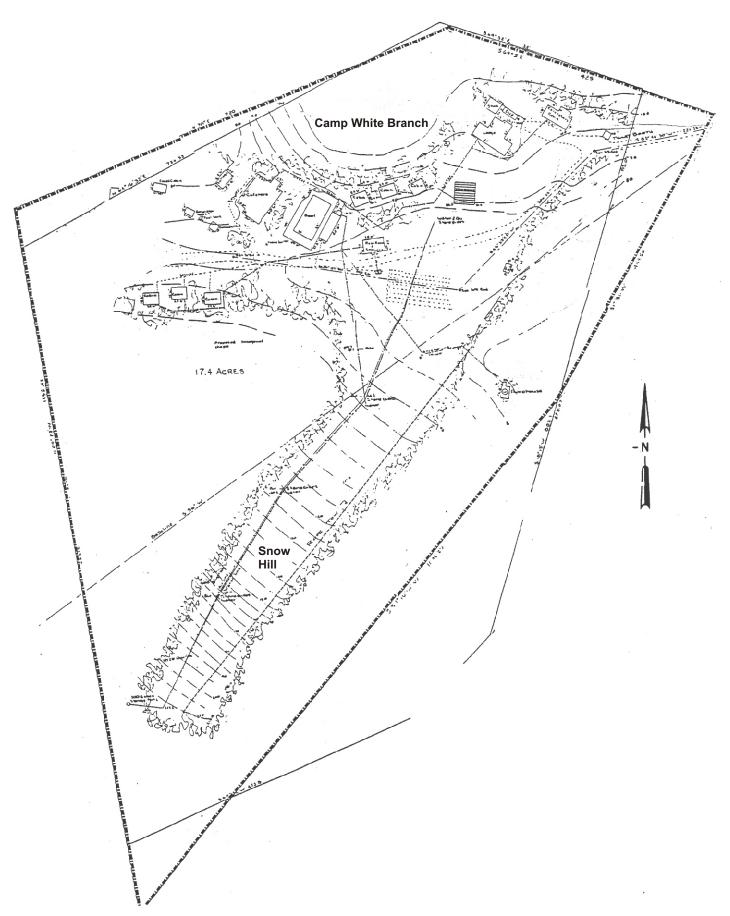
Current site plan for Camp White Branch (Cox 1998:4).
